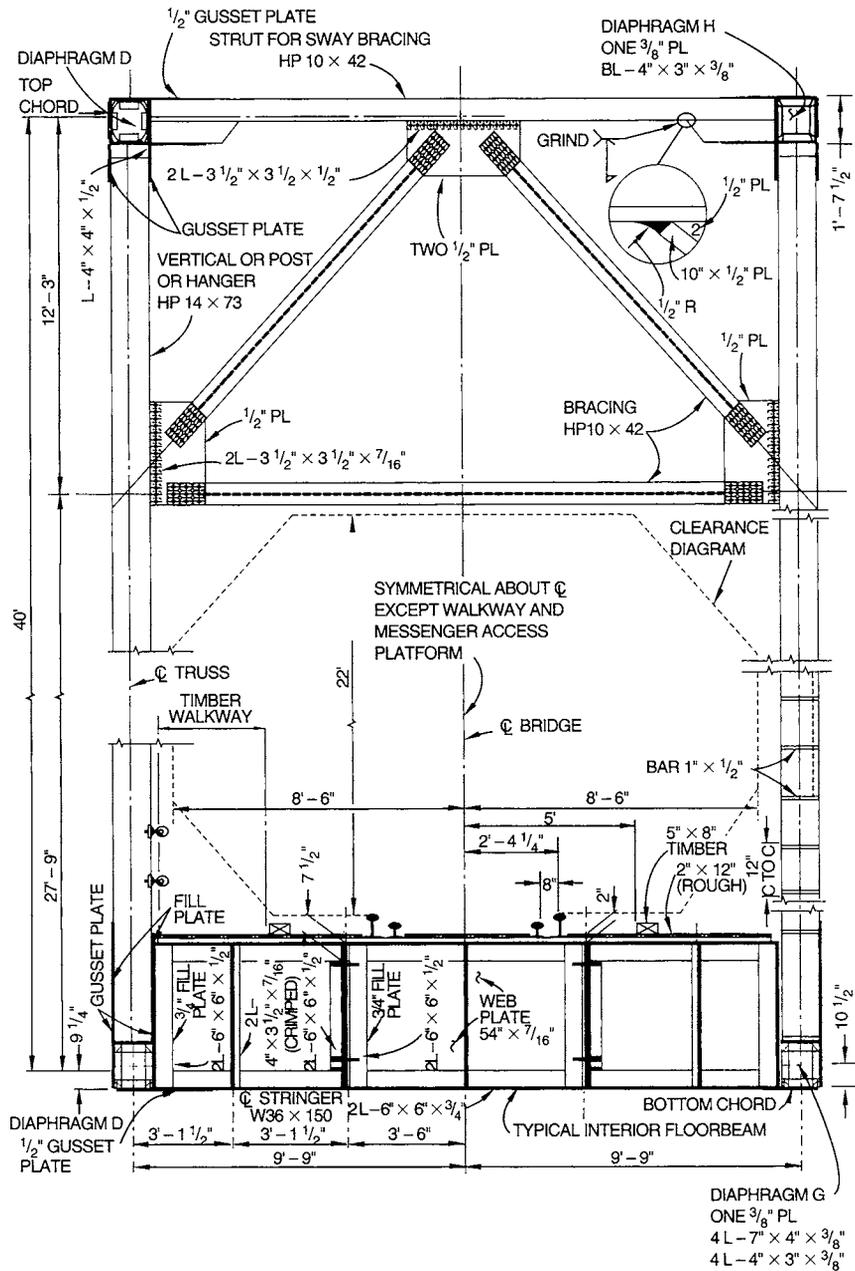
Cross section shows principal parts of a through-truss railway bridge.
